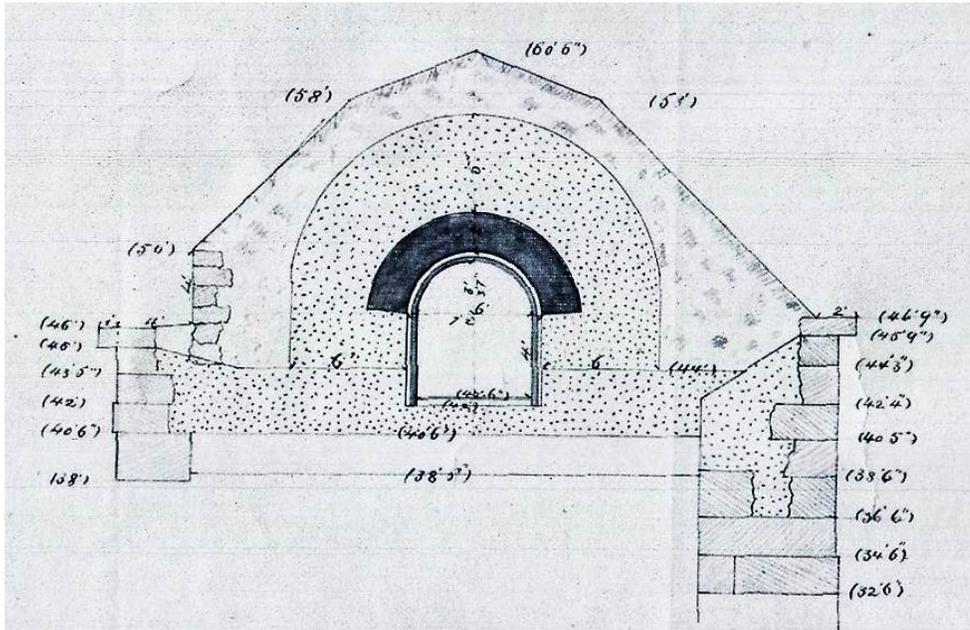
Section of magazine from original drawings. Note cinder concrete, retaining walls, and earthen terreplein construction.
